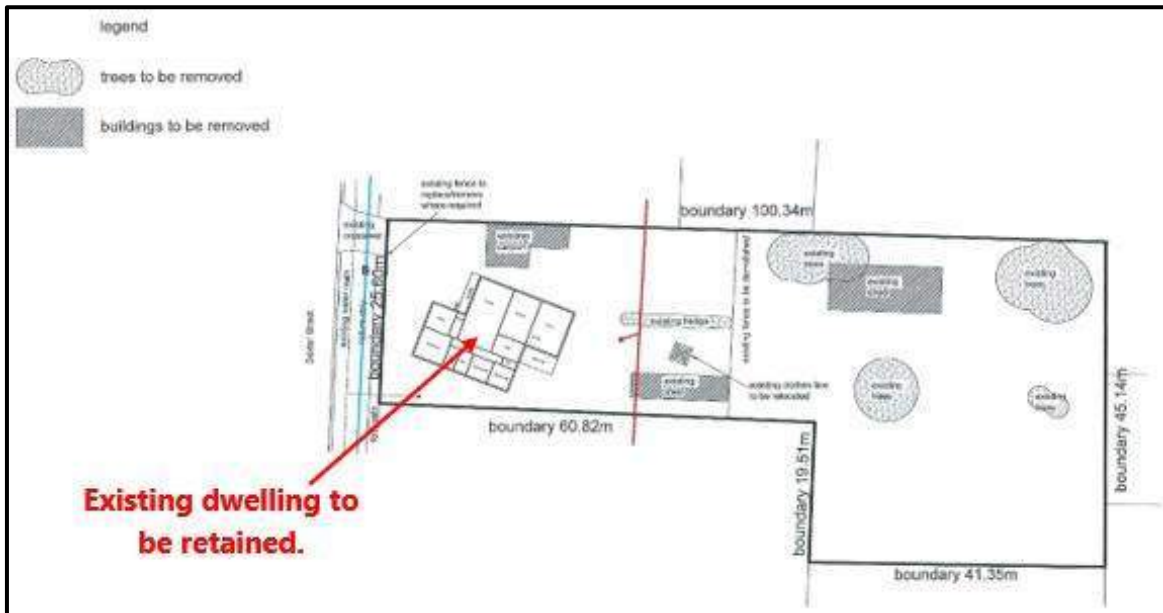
Excerpt of the submitted demolition plan showing the location of existing buildings and trees to be removed and dwelling to be retained.
